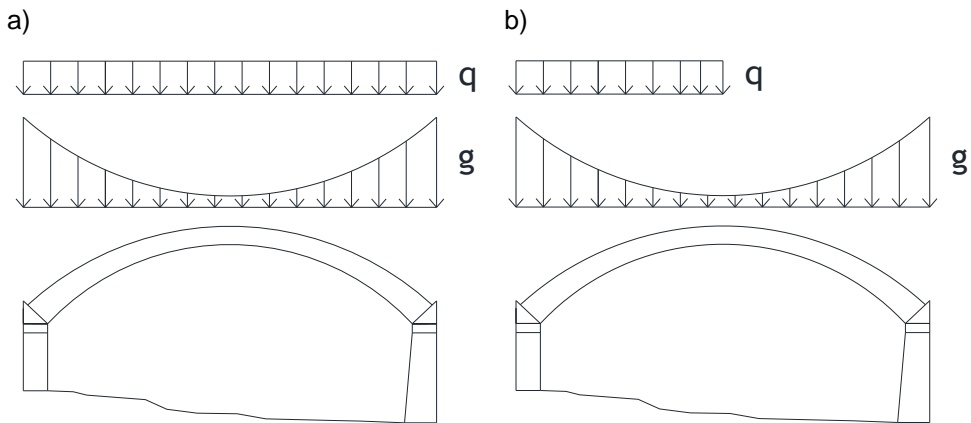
a) Dead load and traffic load on the whole arch length, b) dead load and traffic load on half arch length
